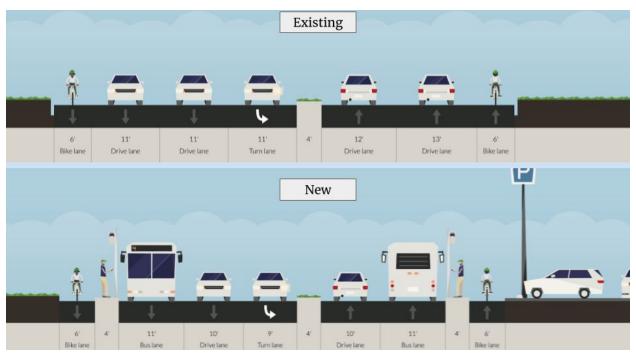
Current existing and new proposed recommended dimensions of Water Street at the Market to May segment. Graphics developed using Streetmix.
